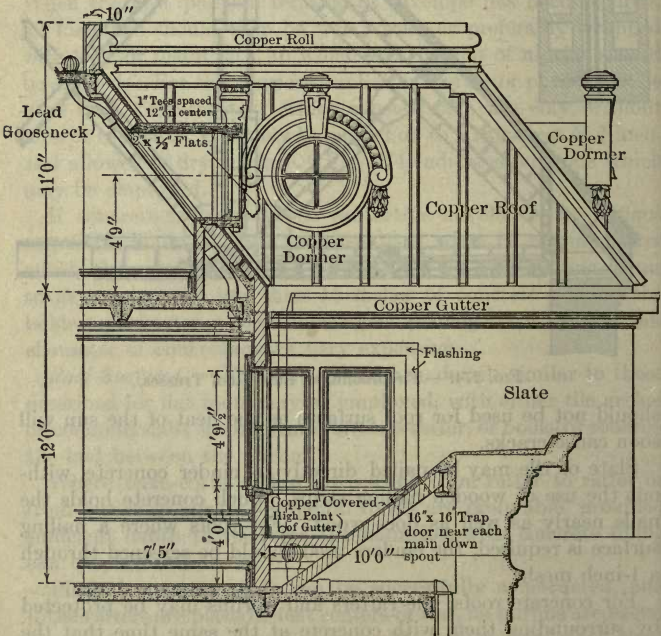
Mansard Roof Construction, U. S. Public Building, Los Angeles.
